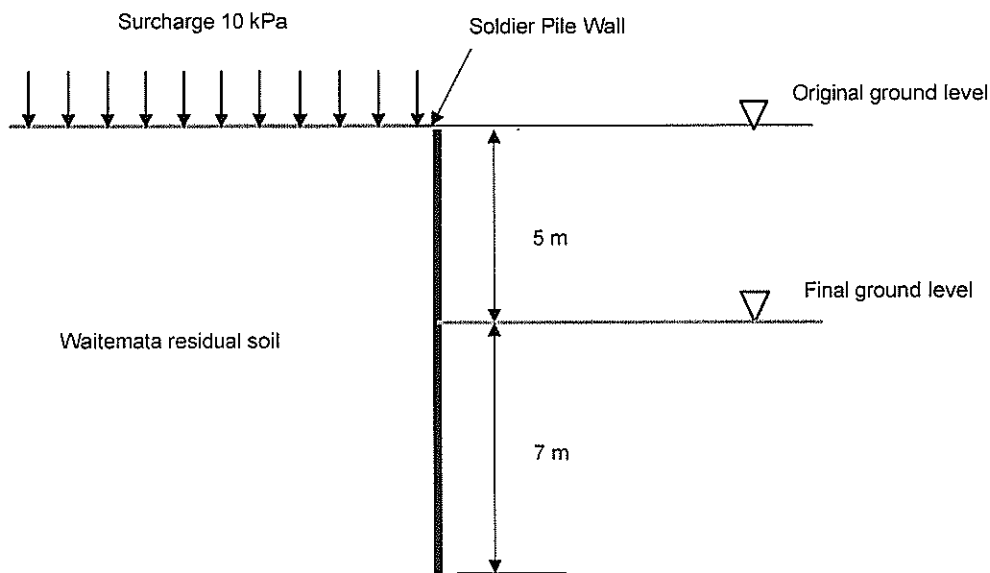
Proposed Retaining Wall and Simplified Soil Conditions
